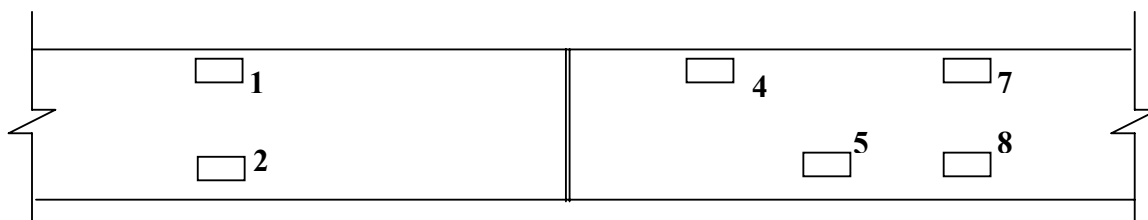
Slab cross-section at wheel path showing typical strain gauge locations
